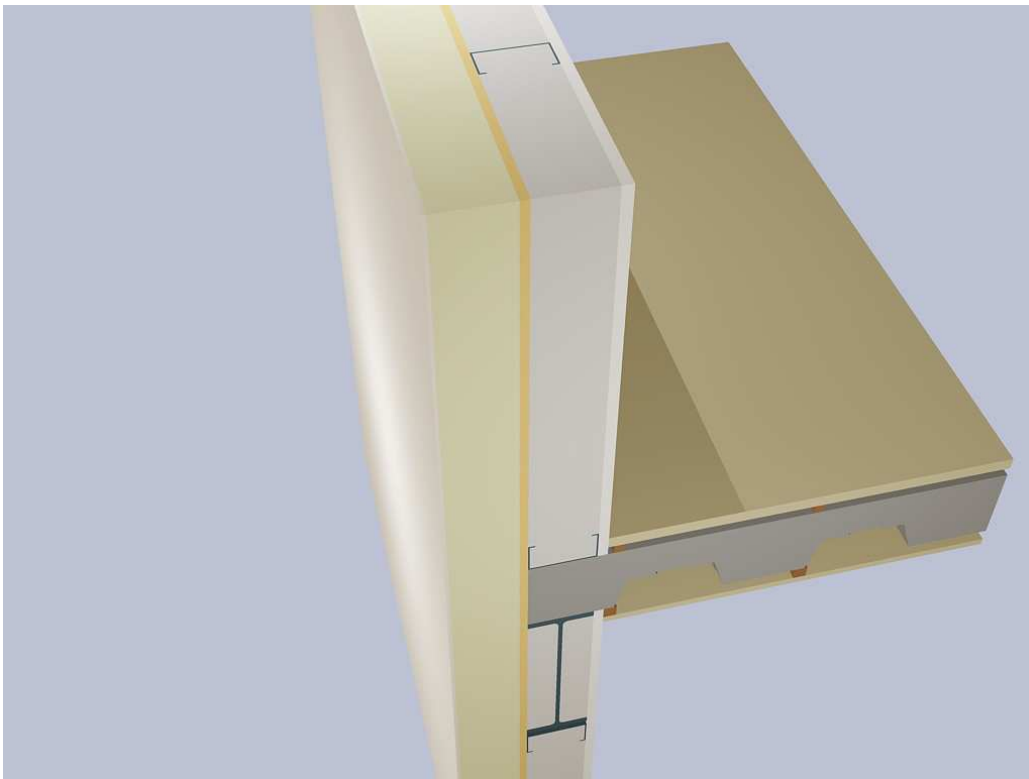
Direct fix of single layer of *Aqua Board* in an infill wall in a steel framed building
